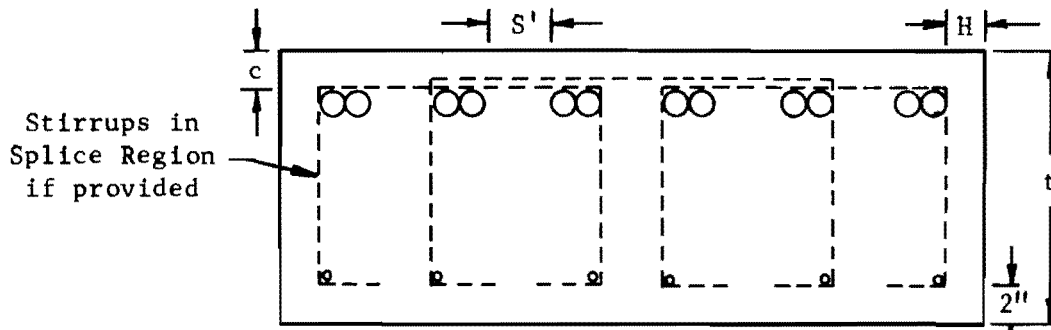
Typical cross section of #6, #8, and #11 bar specimens with all bars spliced (shown in testing position)
